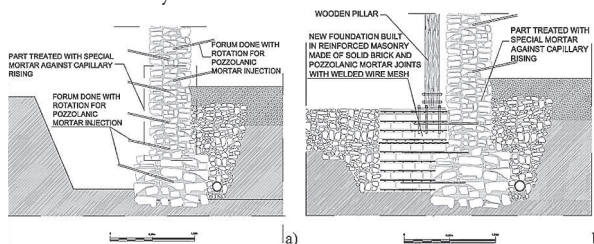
The restoration of the masonry foundation (a) and the new wooden frame foundation (b)
